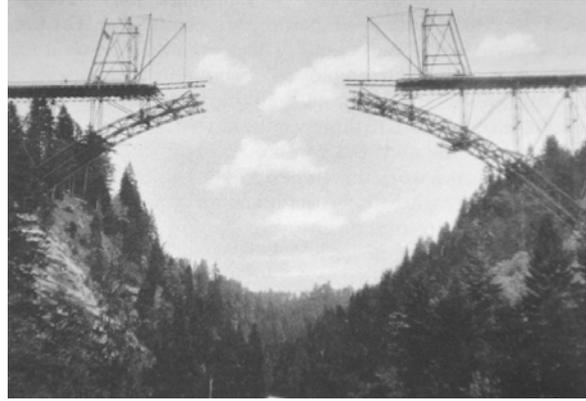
Erection of the steel lattice truss to construct the Ammer Bridge at Echelsbach, Germany, using the Melan Method, 1929. (Wittfoht)
